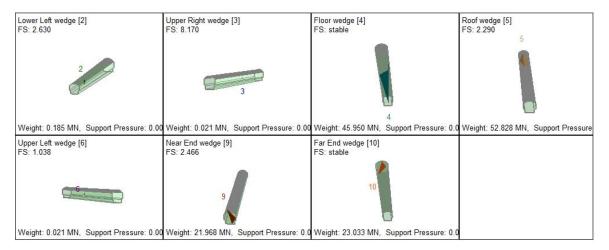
Multi perspective view of wedge failure alternative II (Section C-C)
